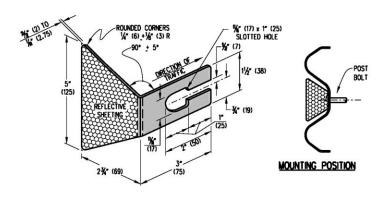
, SHEET 7 OF 10 HARDWARE
